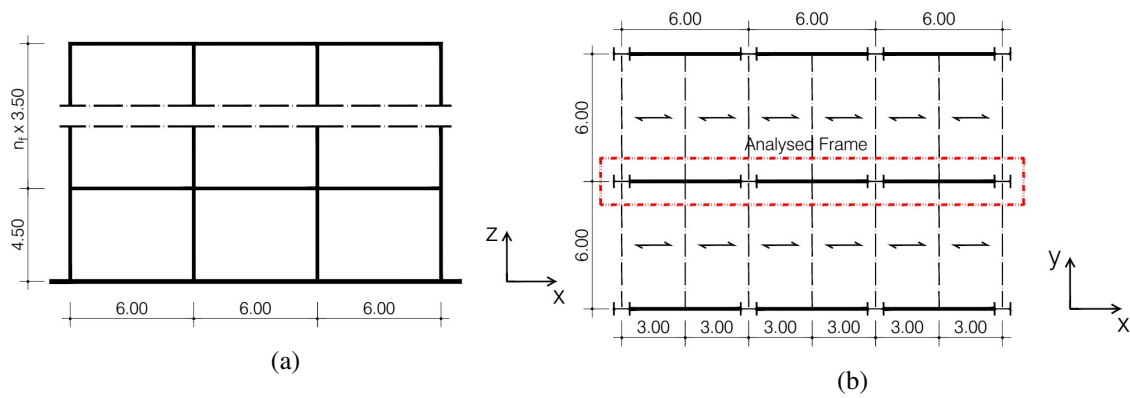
Building configuration 1: a) Elevation view, b) Plan view.
